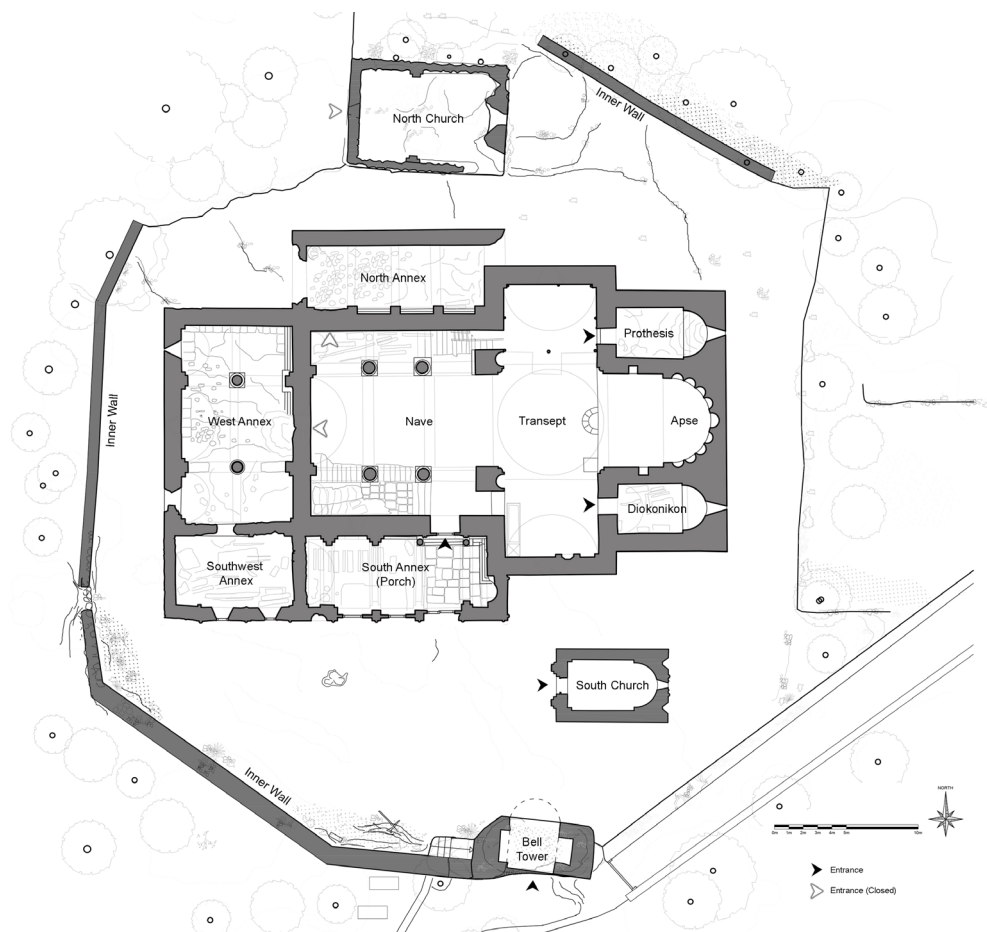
Elevation plan (+1.50 m) of Khakhuli Monastery (drawing by the authors, 2016).
